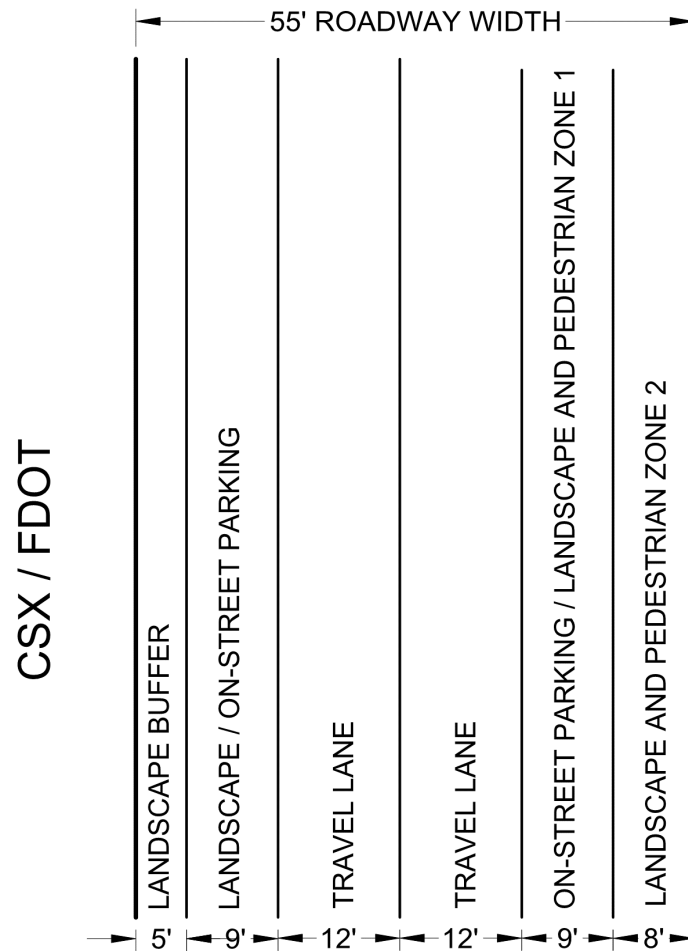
b SW 30th Avenue Road Profile Not Abutting Interstate-95
